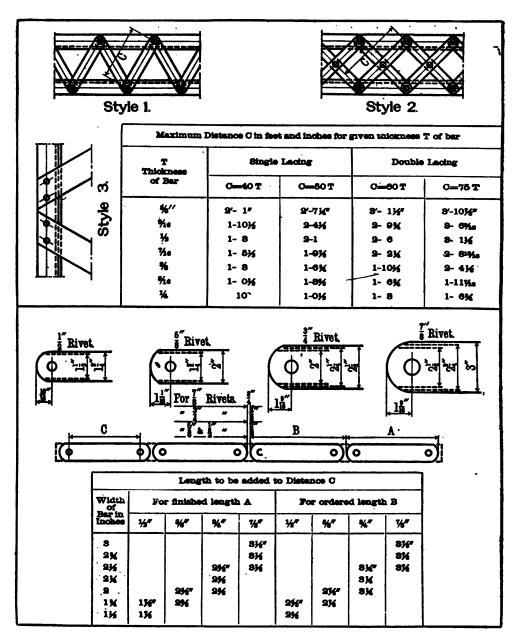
Standards for Lacing Bars. American Bridge Company.
